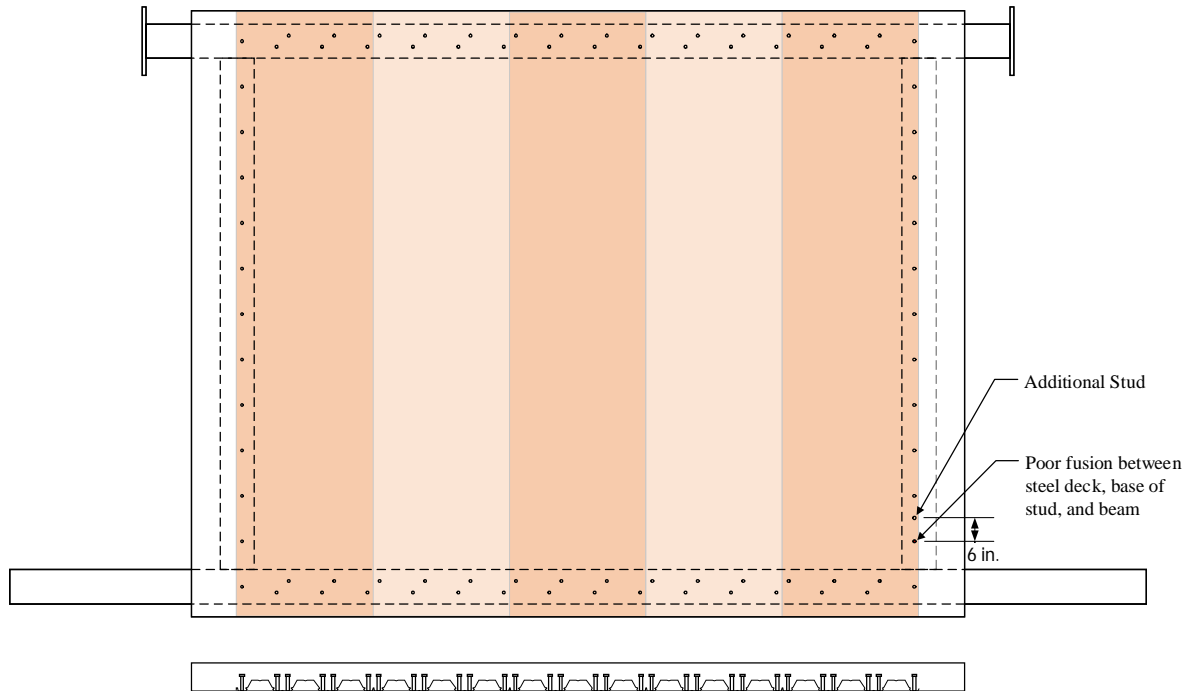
Location of Poor Fusion Between Weld at Base of Stud, Steel Deck, and Top Flange of Beam for Specimen 3/7.5-NW-NF-RS
